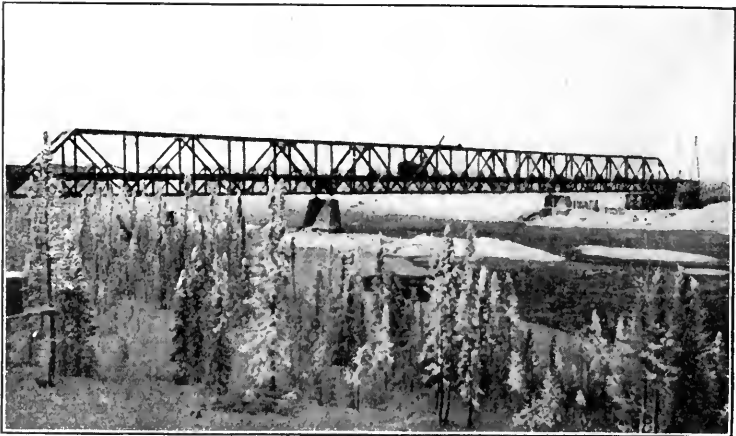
General view of bridge, taken from the south shore and looking up-stream.
